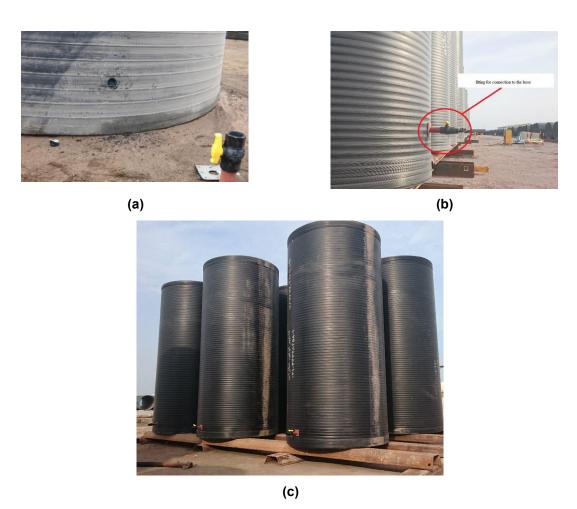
The pipe grouting sequences, a. injection hole, b. fitting for connection to the grouting hose, and c. vertical position of pipes for grout injection
